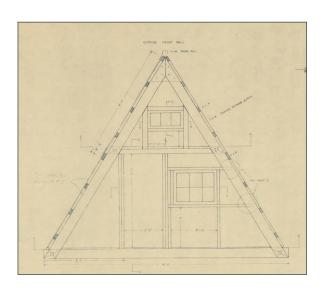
Front façade detail from cabin plan Hunter Cabin 'A' frame: ADF&G: 1962
